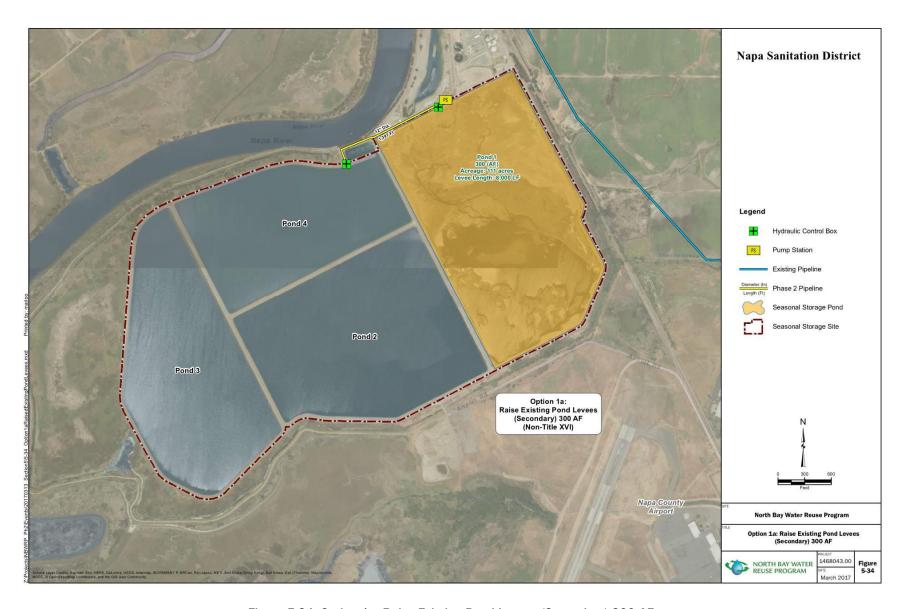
Option 1a: Raise Existing Pond Levees (Secondary) 300 AF
